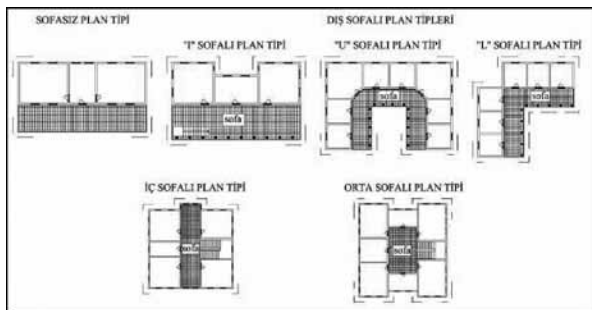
Plan Types with Hall(AKTUNA, M,2007)
